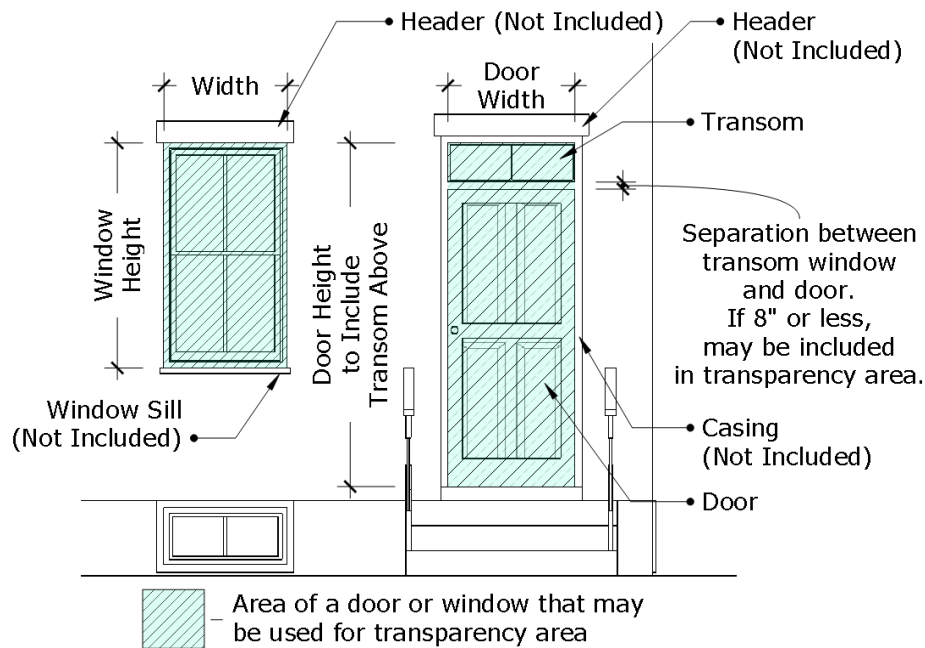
K: Area of a Window and Door That May be Used to Calculate Transparency; See also Section 1315.08.A.1 - Ground Floor Transparency.
